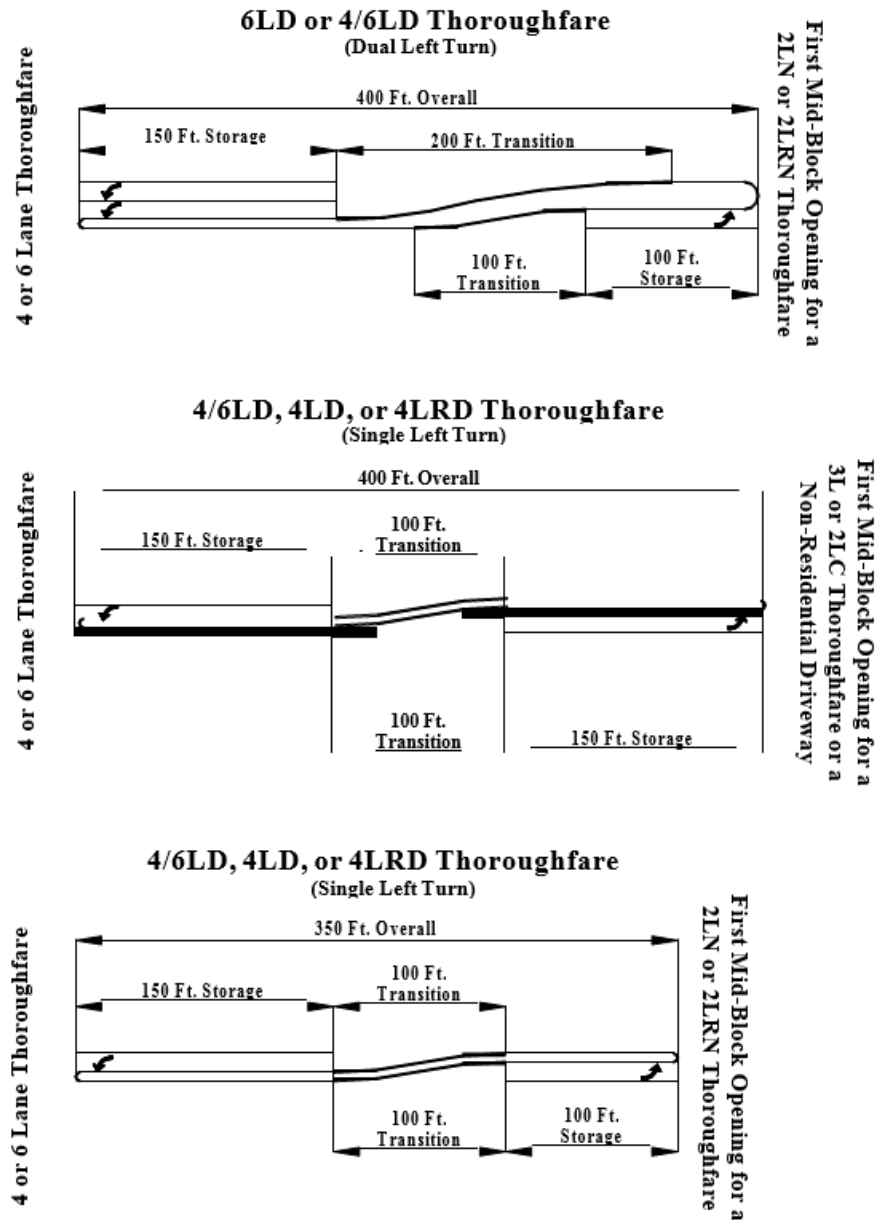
Minimum Spacing Between an Intersection and the First Mid-Block Median Opening on a Divided Thoroughfare
